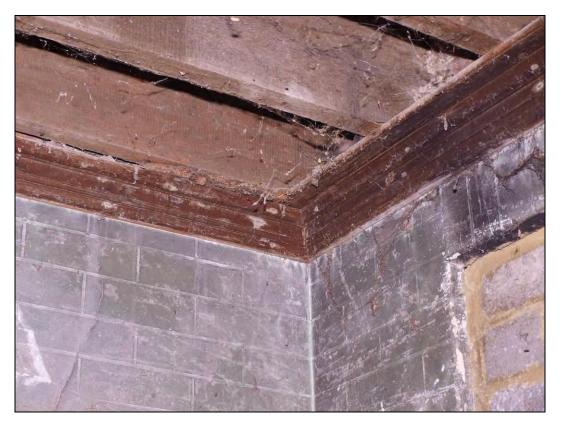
Stable, interior, ground floor, detail of ceiling cornice, facing southeast (6959-0011)
